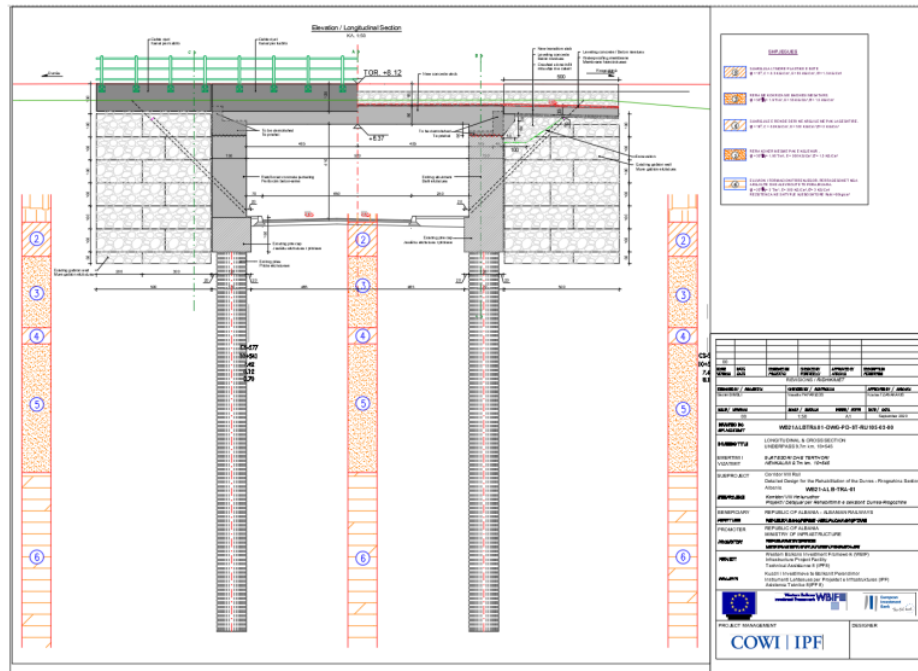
Lithological cross-section at Shen Vlashi Bridge
